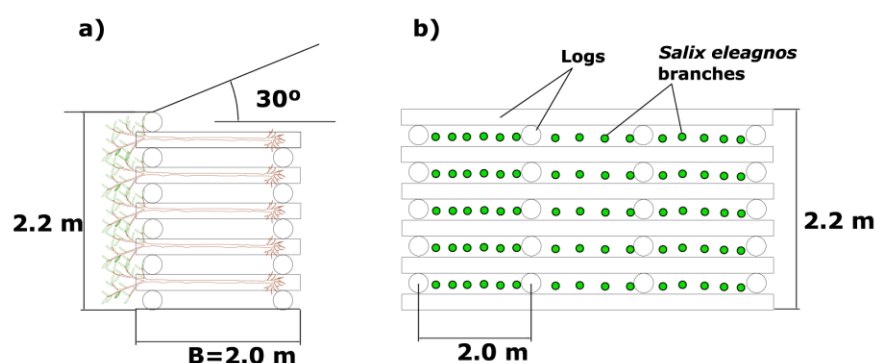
Log crib wall geometry: (a) cross-section ( $B$  = log crib wall width) and (b) front-view.
